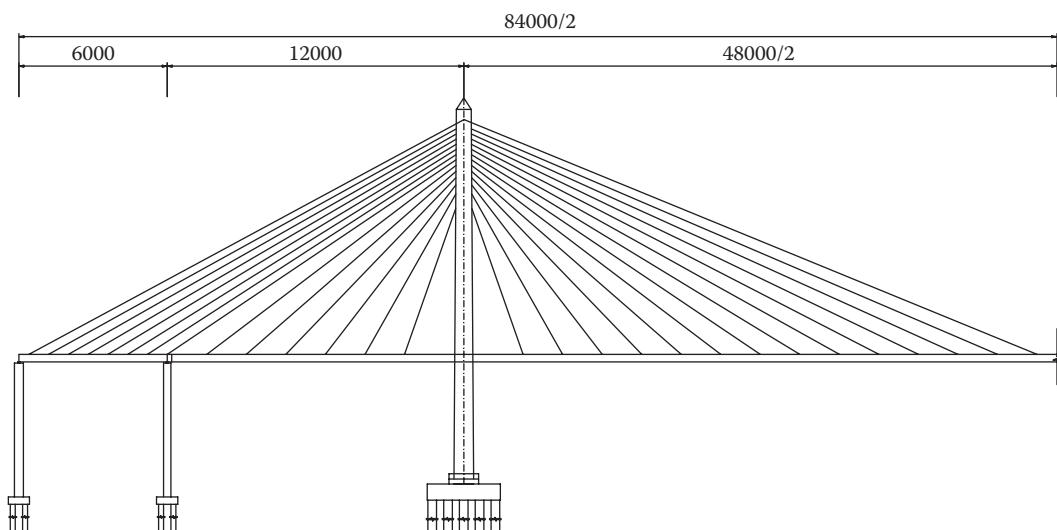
Elevation view of a cable-stayed bridge.
